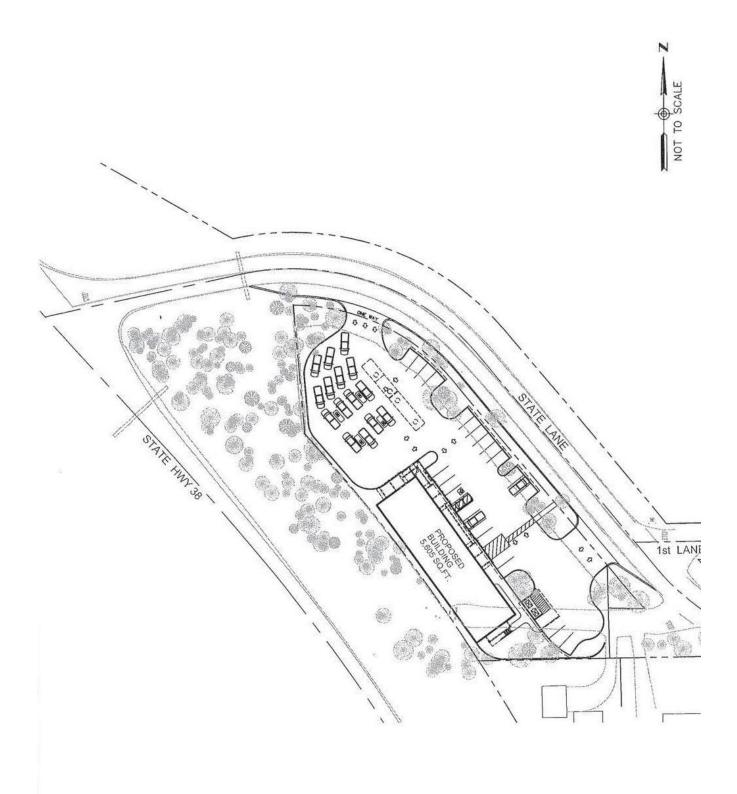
B: PRELIMINARY SITE PLAN
